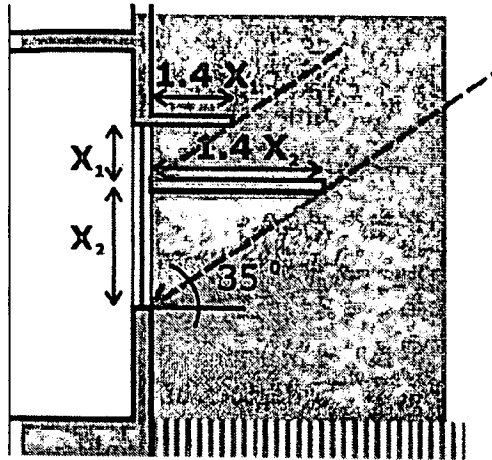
Section through southwest window with multiple overhangs (35- degree cut-off angle).
